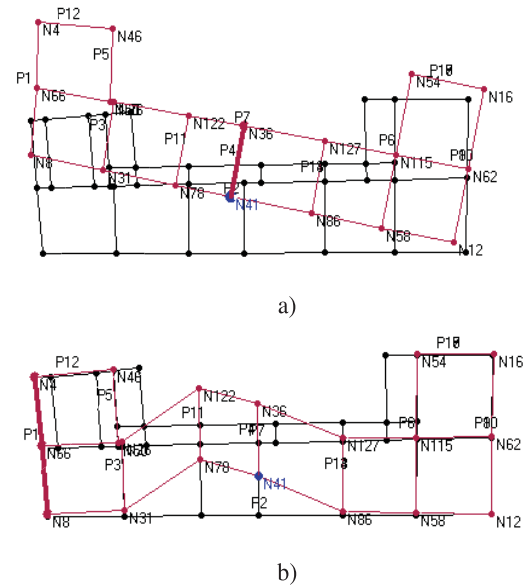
Plan deformation at the third level for a) rigid and b) flexible floors models.
